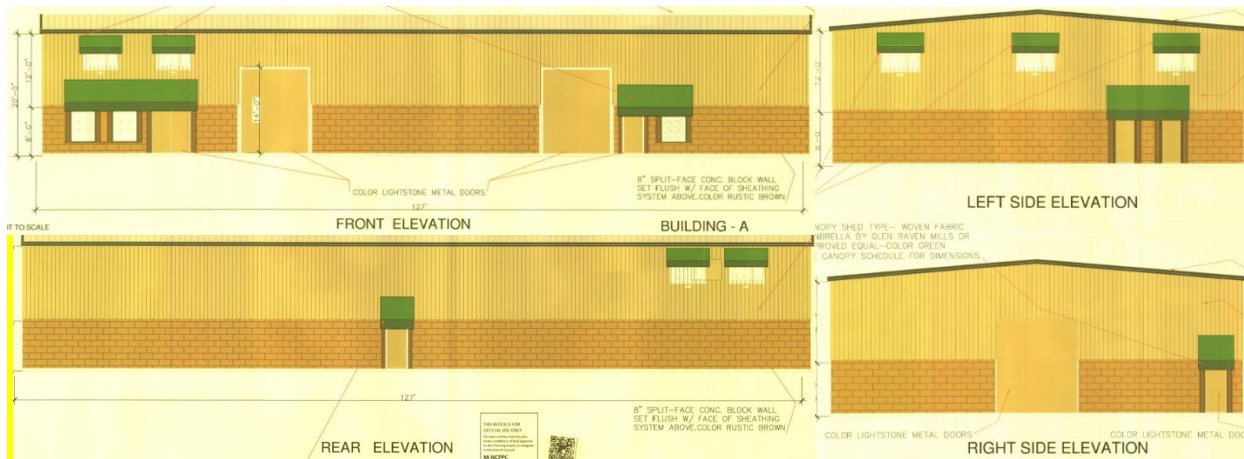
Proposed Architectural Elevations for Building A. Similar architecture is proposed for Buildings B and C.
